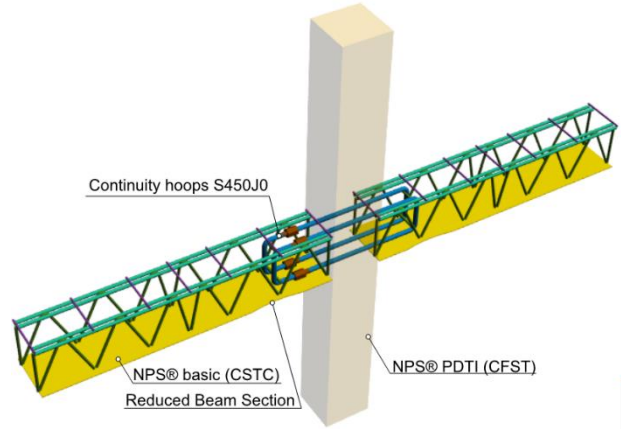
Qualitative View of Beam and Panel Zone Reinforcement Layout for HD NPS® Specimens
